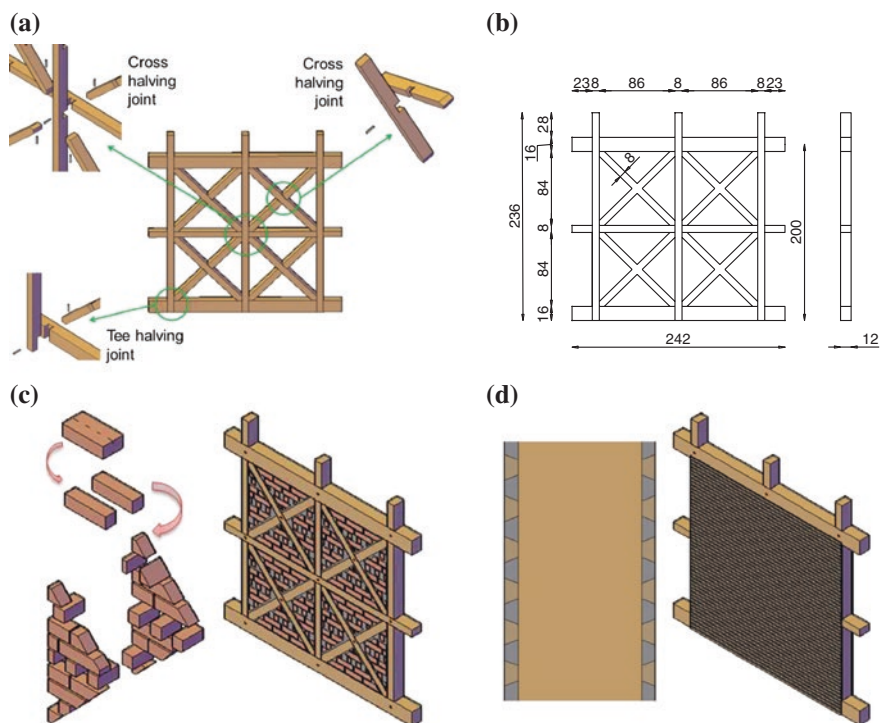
Wall specimens: a connections used; b dimensions of elements in cm; c masonry infill; d lath and plaster
